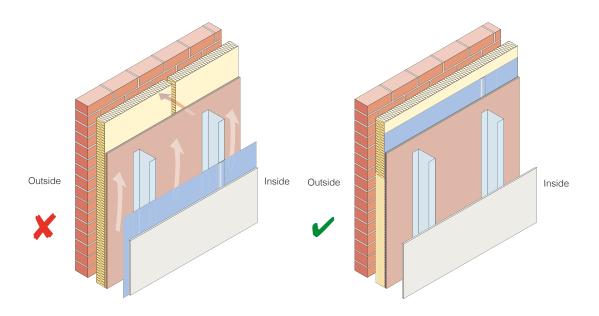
The air barrier must be contiguous with insulation, and therefore positioned outside of the frame. If the air barrier is placed on the inside face of the frame, air and heat movement within the frame void could bypass the insulation, at weak points in the insulation layer.
